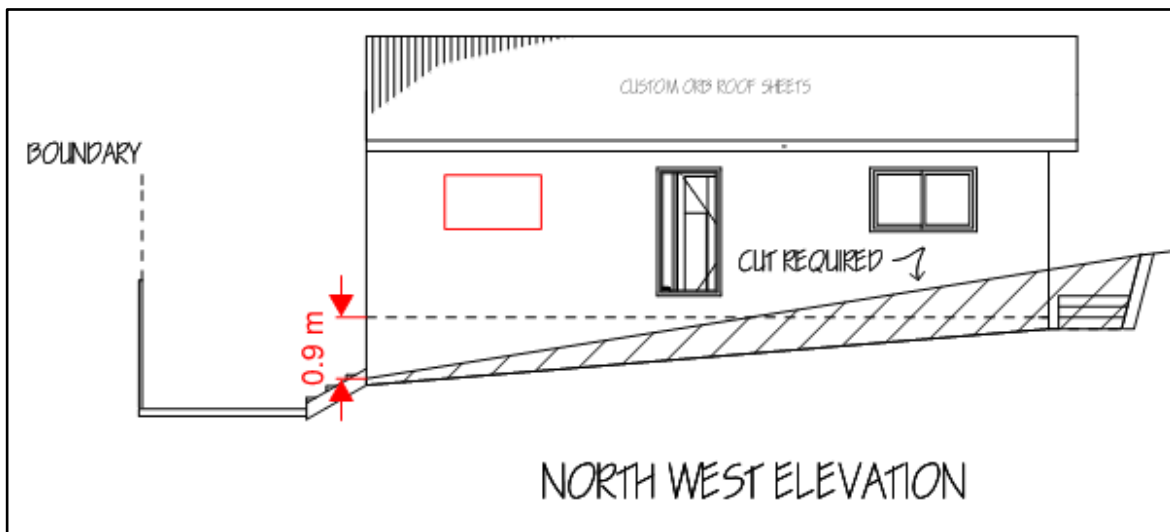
proposed north-west elevation showing the height of the finished floor surface and approximate location of relocated window
